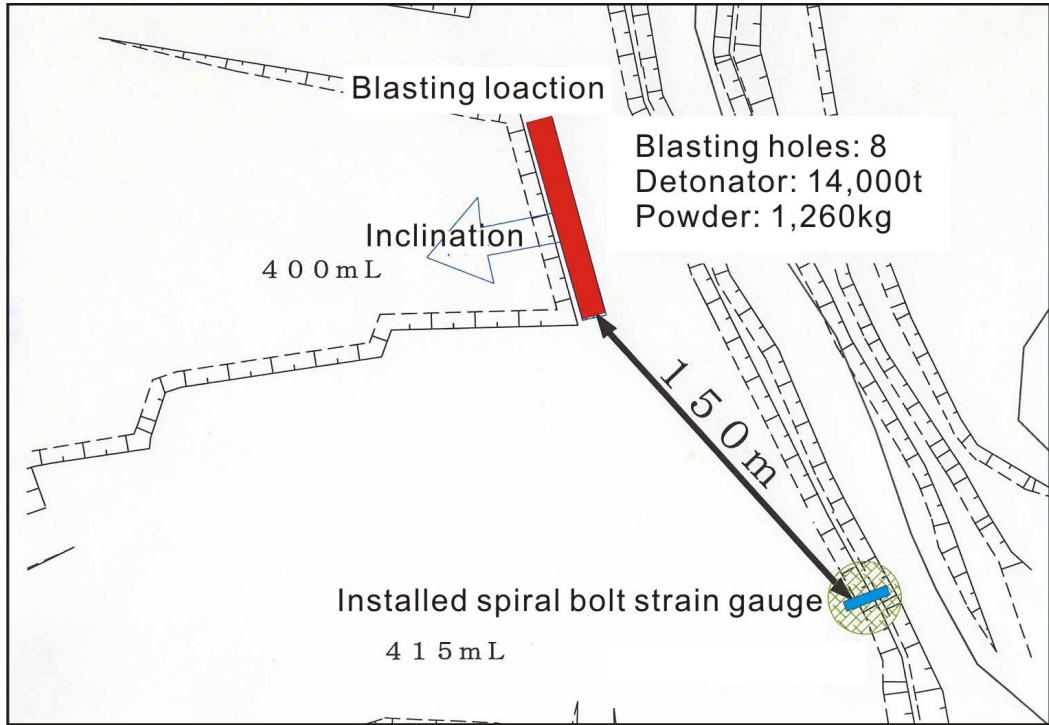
Blasting location for excavation of limestone mine and installed spiral bolt strain gauge.
